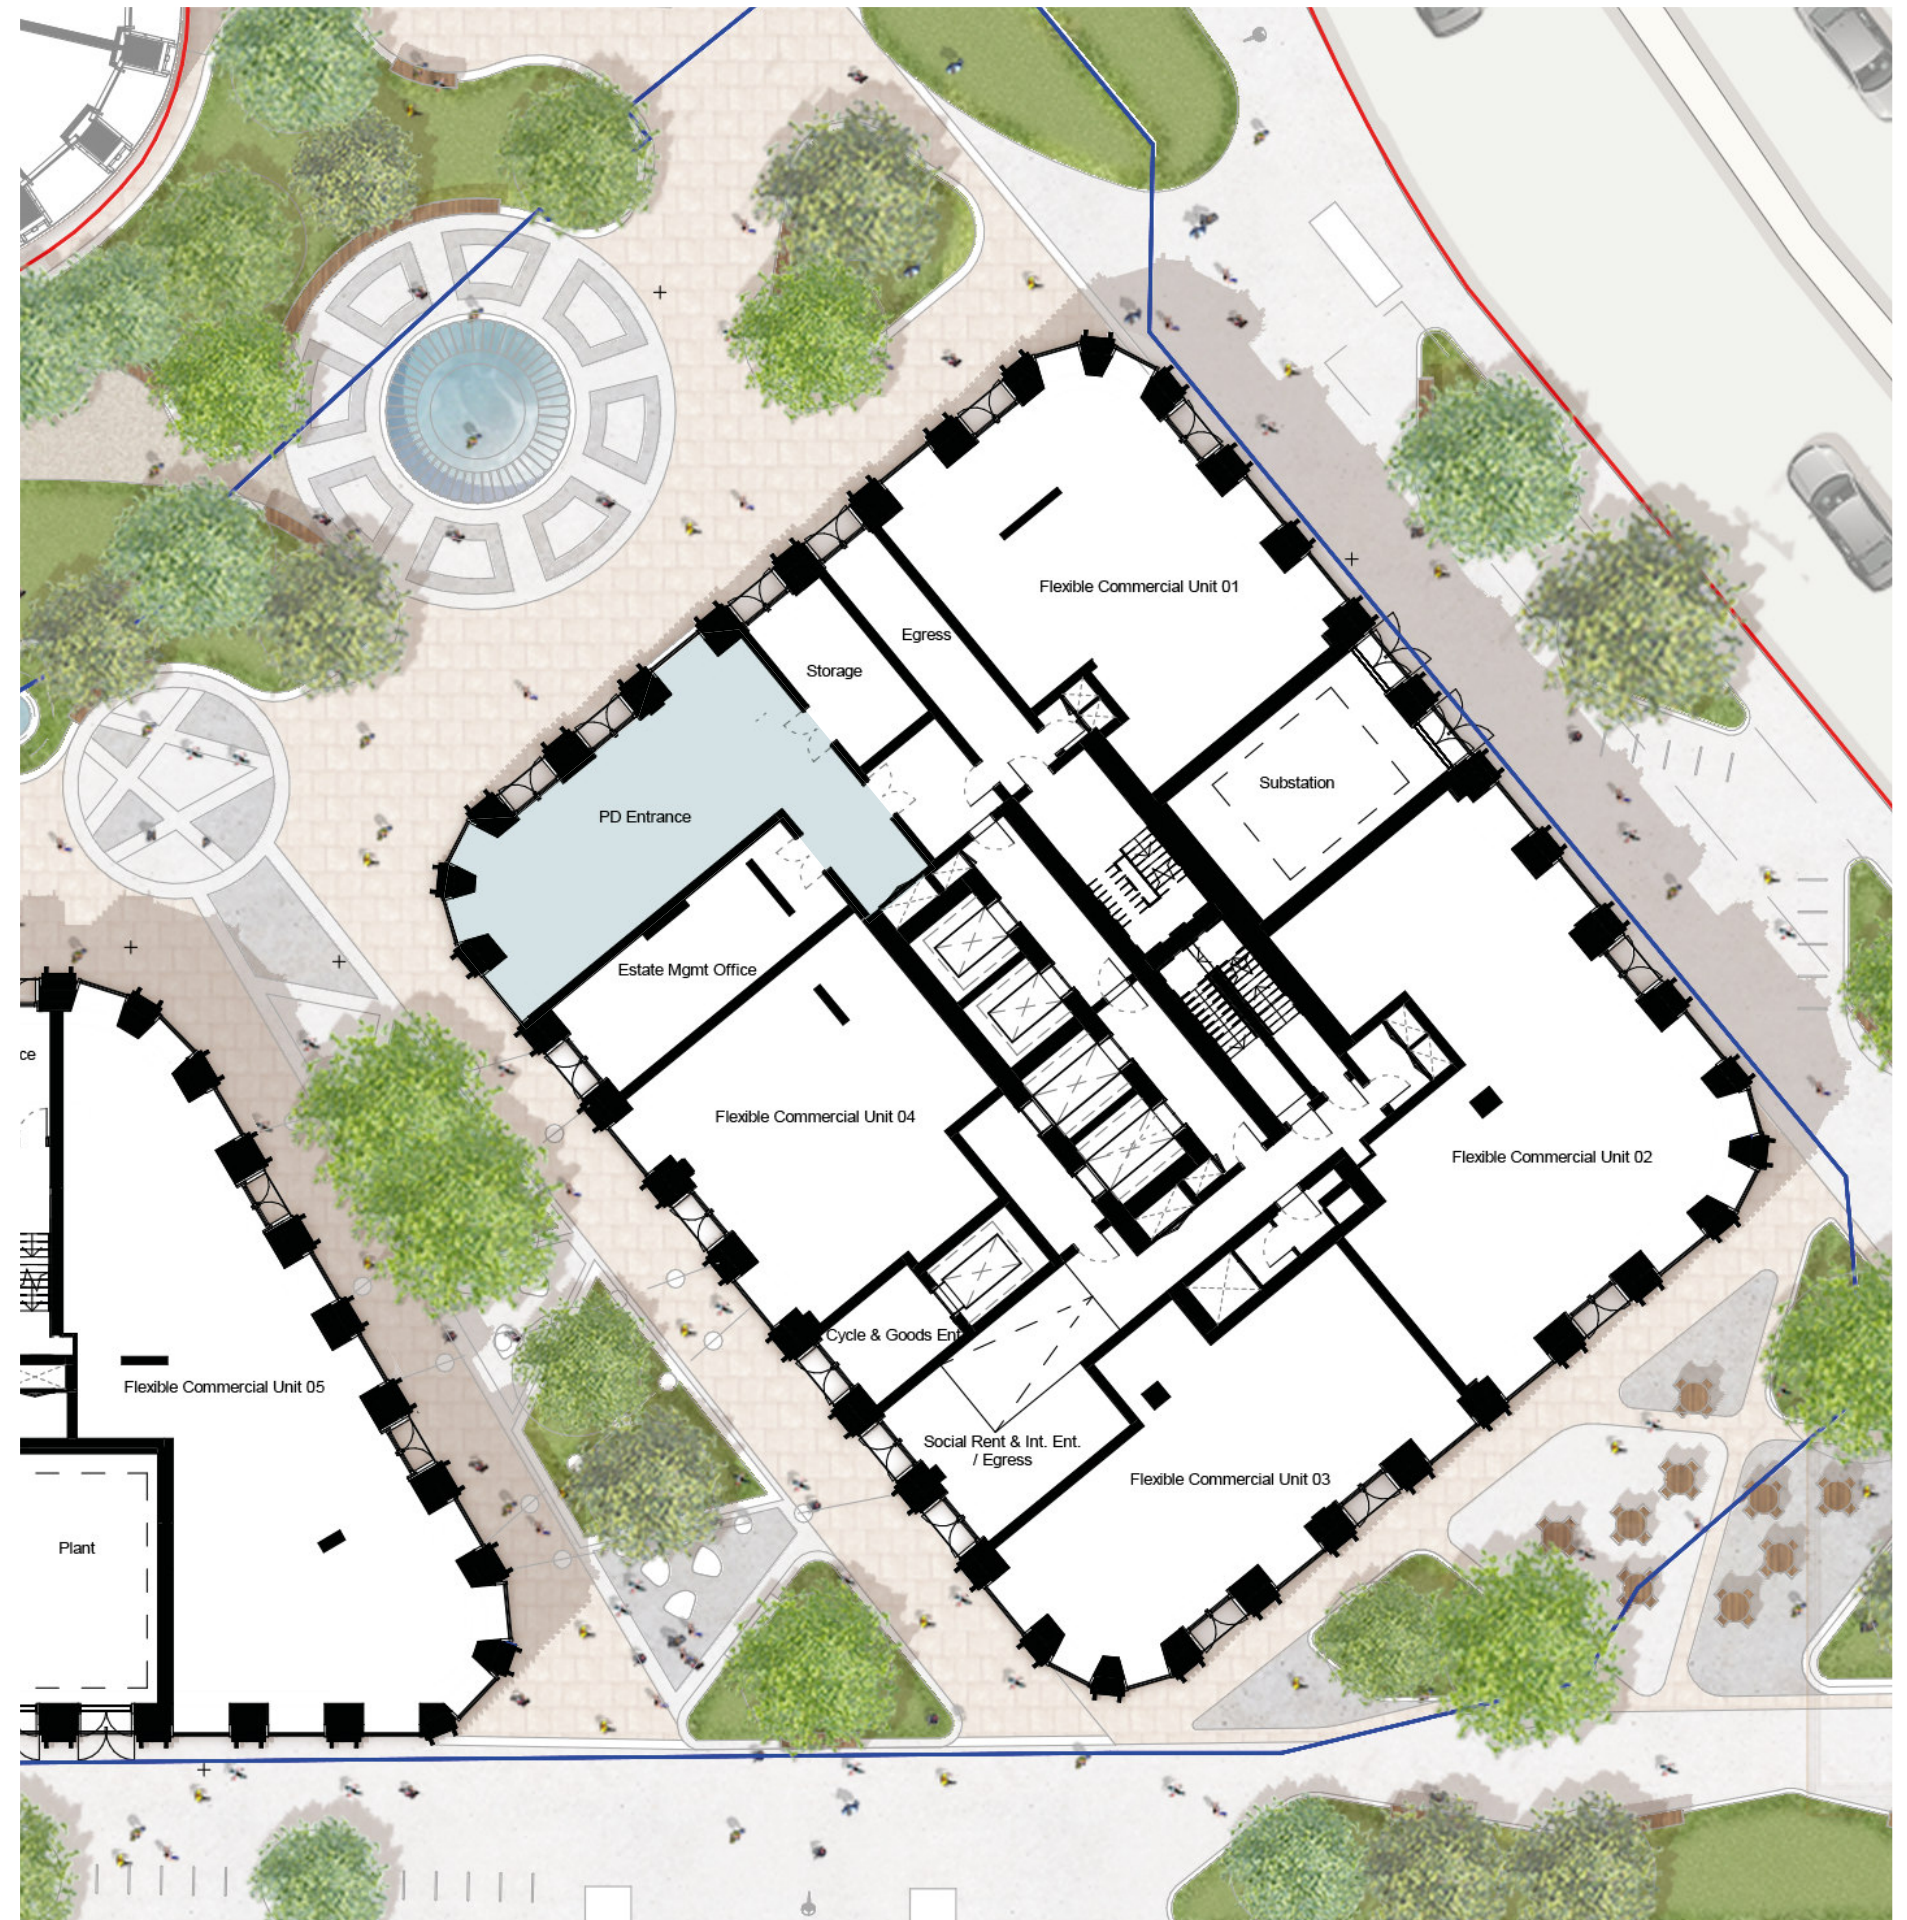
Block K Ground Floor Plan - Residential Reception Area
